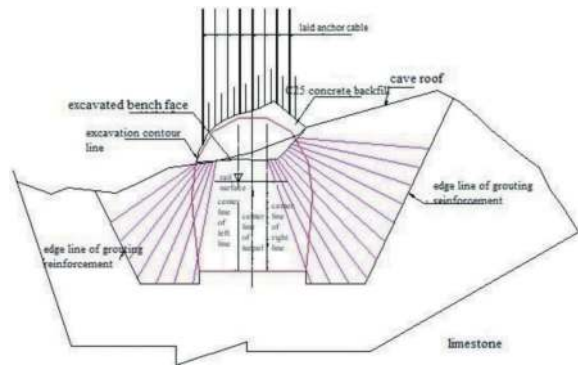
Diagram of the pre-grouting and reinforcement of the backfill body.
